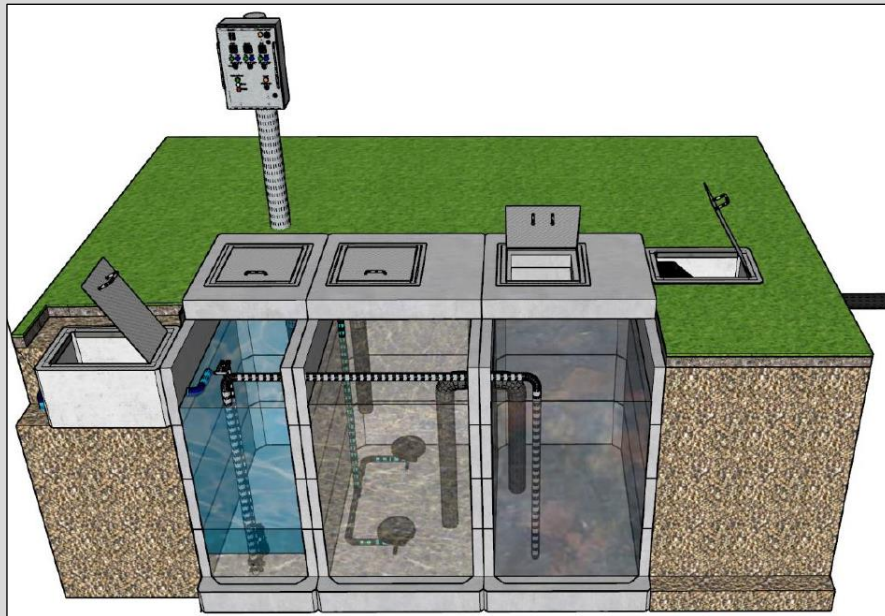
Sewage Bioreactor to be installed at each pod underground (Source: Element Engineers).
